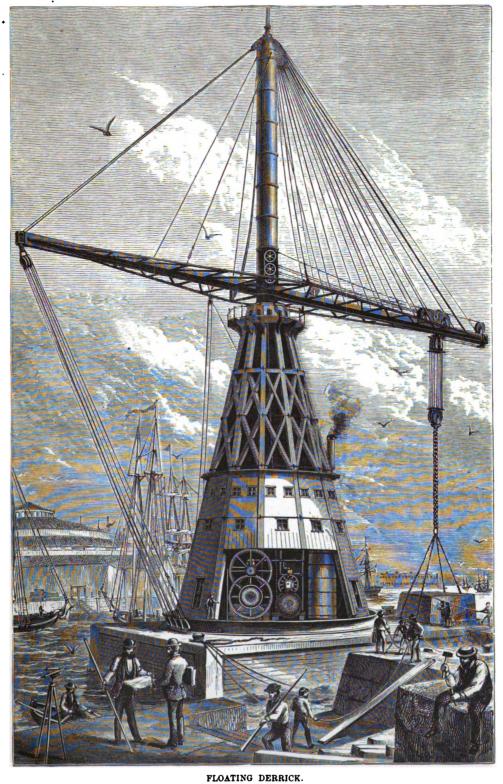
PLATE XIII. NEW YORK DEPARTMENT OF PUBLIC WORKS.
